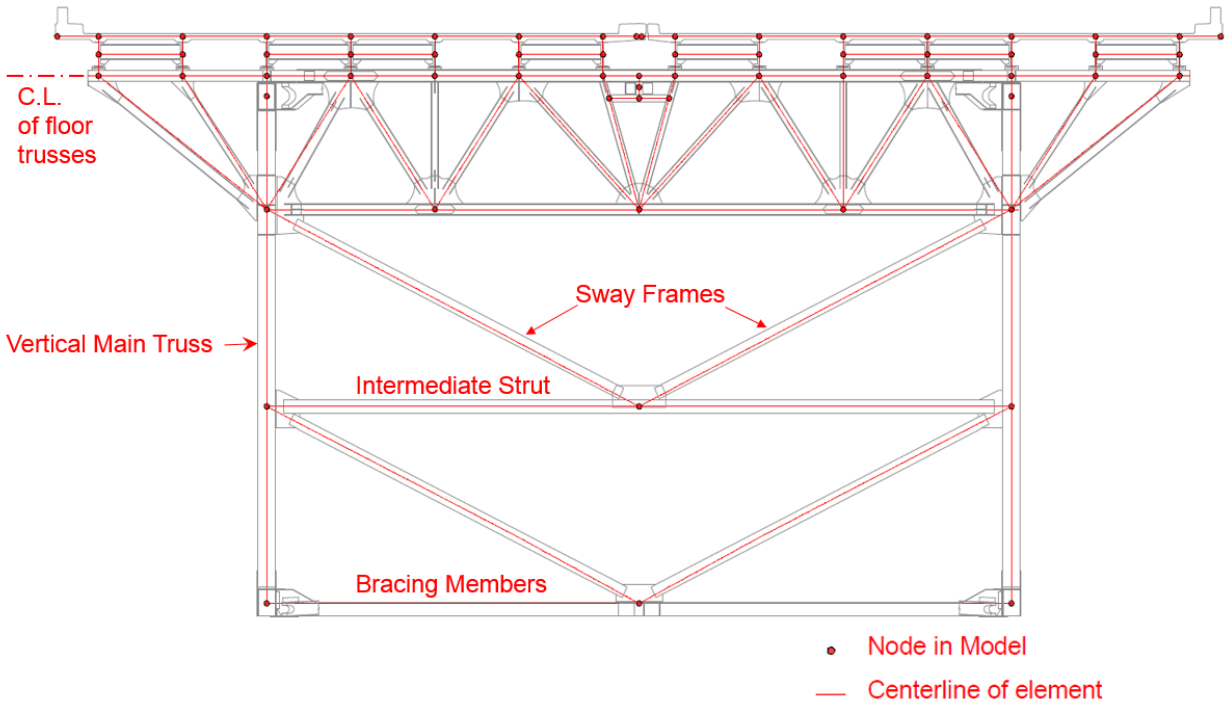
2D view of the idealized members and connections in the floor truss system. Ocel, J. M. and W. J. Wright (2008). Finite Element Modeling of I-35W Bridge Collapse Turner-Fairbank Highway Research Center. Used under fair use, 2015.
